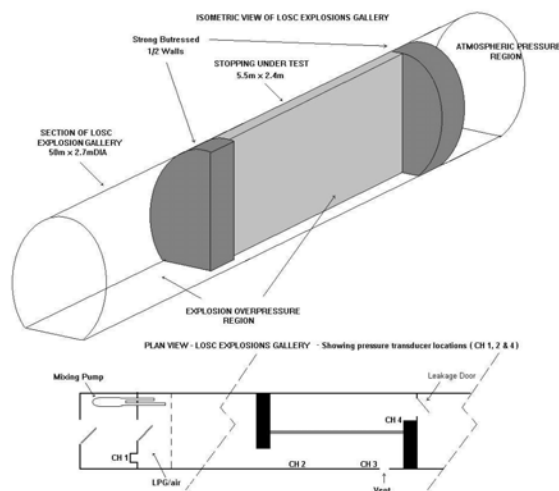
Plan and isometric view of the TestSafe Explosions Gallery.
